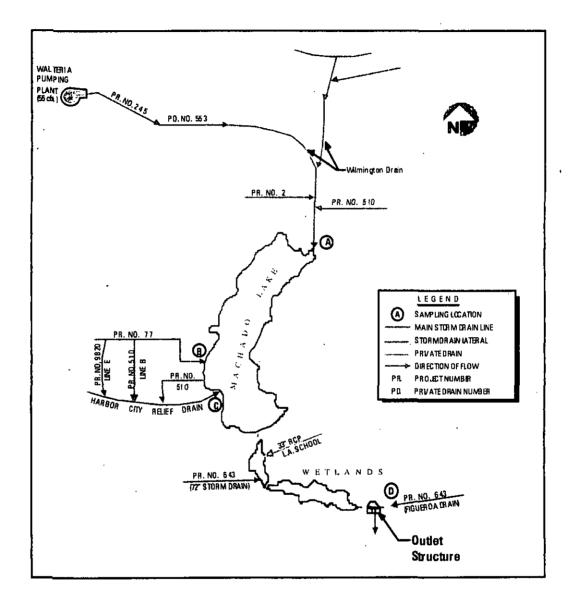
Schematic Layout of Drainage Systems Discharging to Machado Lake
